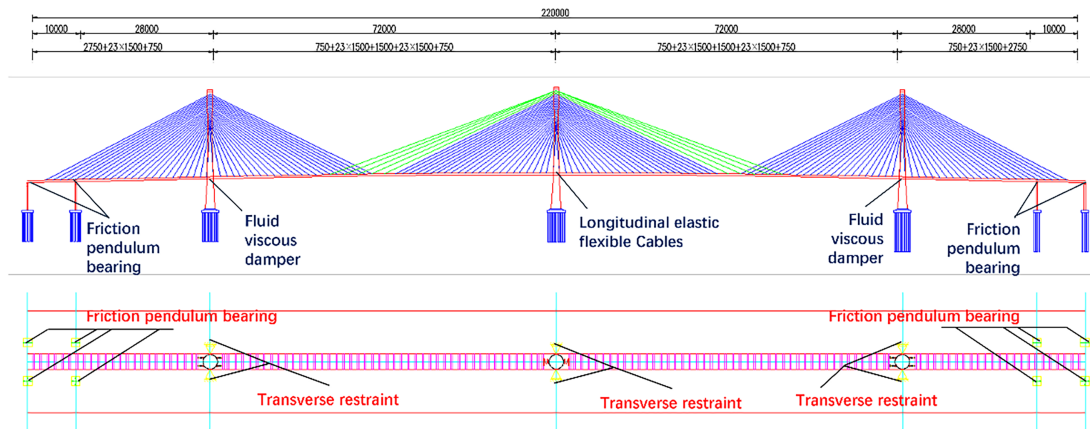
General layout of three-tower cable-stayed bridge (Unit: mm).
